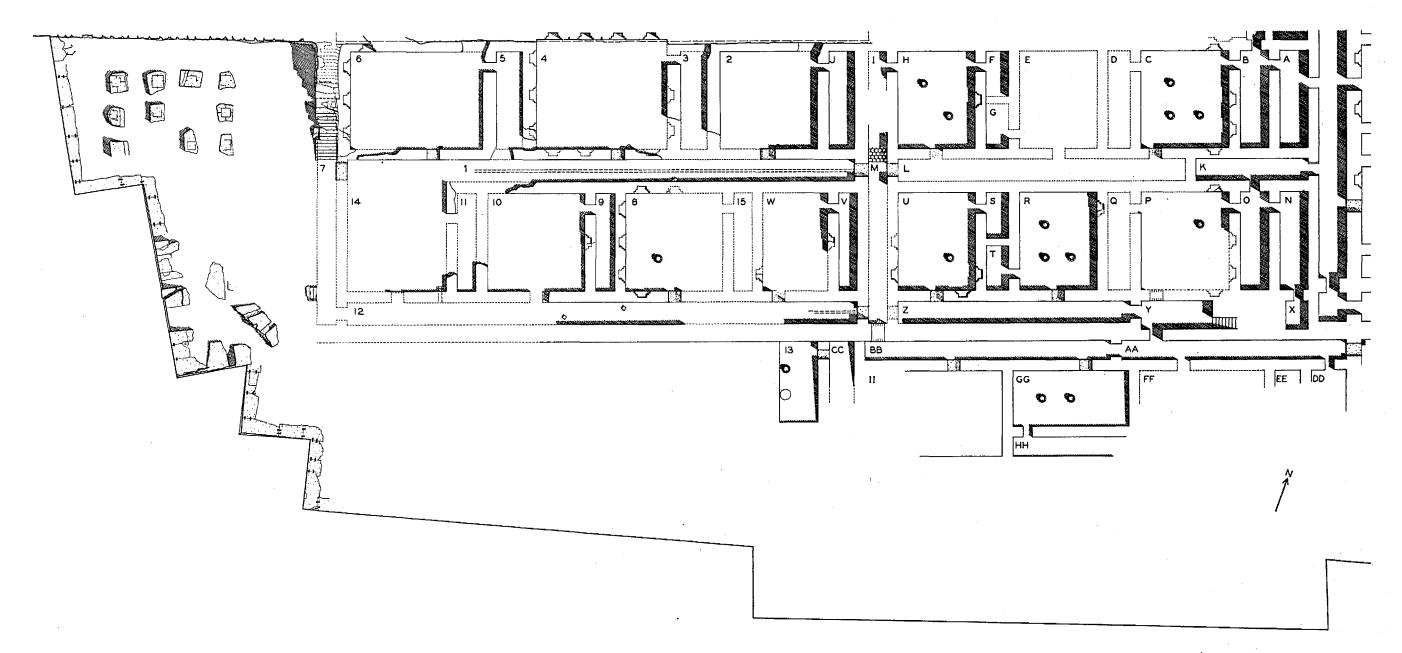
Plan of West Wing of Harem as Excavated, Including Remnants of "Pavilion." Scale, 1:400
